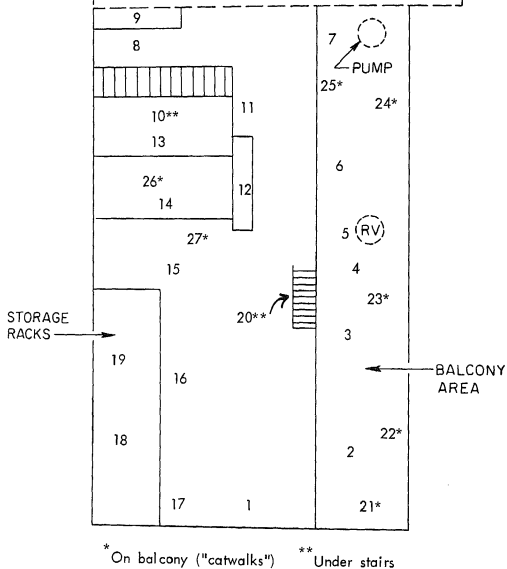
Plan View of Building 9, and Location of Survey Points Listed in Table 4.
